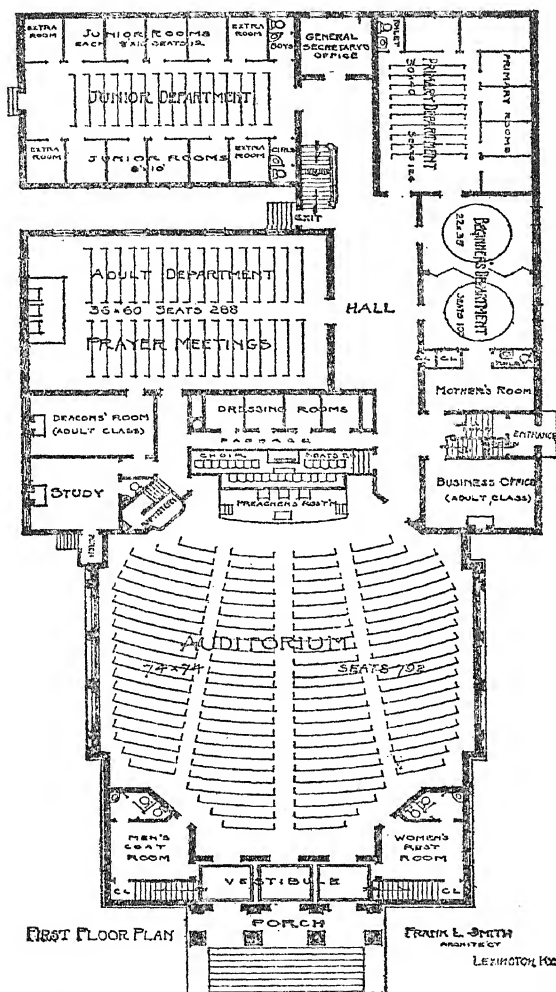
Church building providing for modern Graded and Departmental Sunday School.
